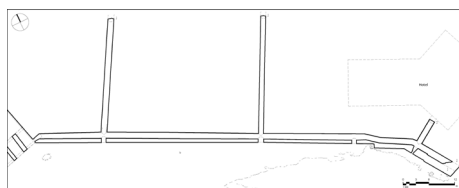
The counterscarp. Plan of vaulted tunnels.
